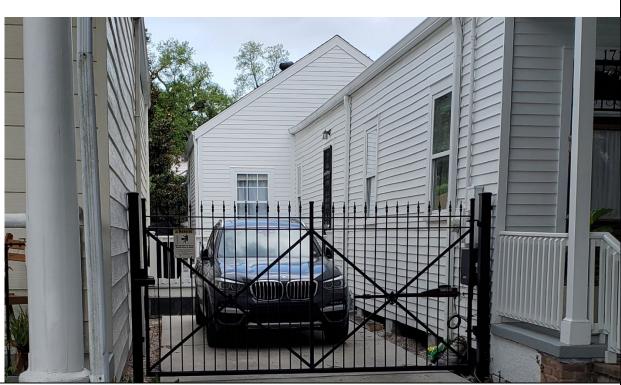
Photograph lean-to to be replaced on the left, with neighbor's addition in the background. Neighbors are adjacent on Short St (address 1733-1735 Short St). Neighbor's addition extends past proposed 1729 renovation (which replaces existing lean-to footprint).
